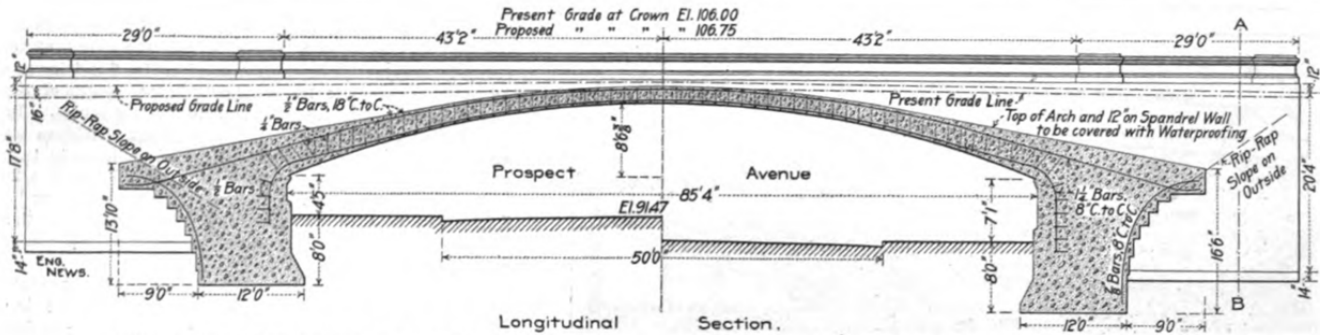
Seeley Street Bridge Arch Reinforcement Section. Source: *Engineering News*, December 31, 1903, 588.
